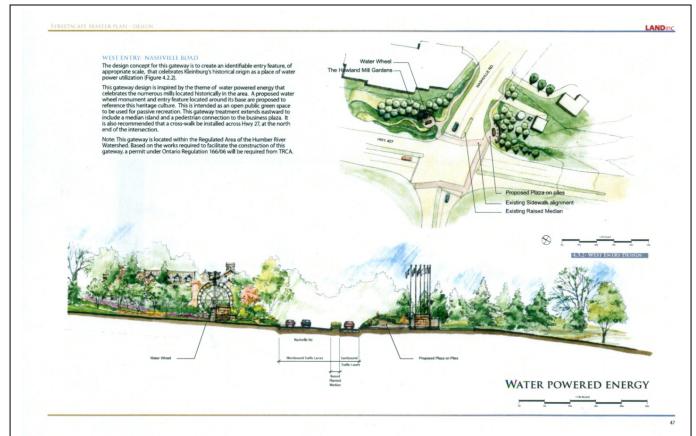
Proposed commemorative feature at Highway 27-Nashville Road intersection, from the 2011 Village of Kleinburg, Islington Avenue Streetscape, Master Plan Study. On the plan, the barn on the right is near the property line of the proposed development. In the elevation, the development will be behind the trees on the right.
